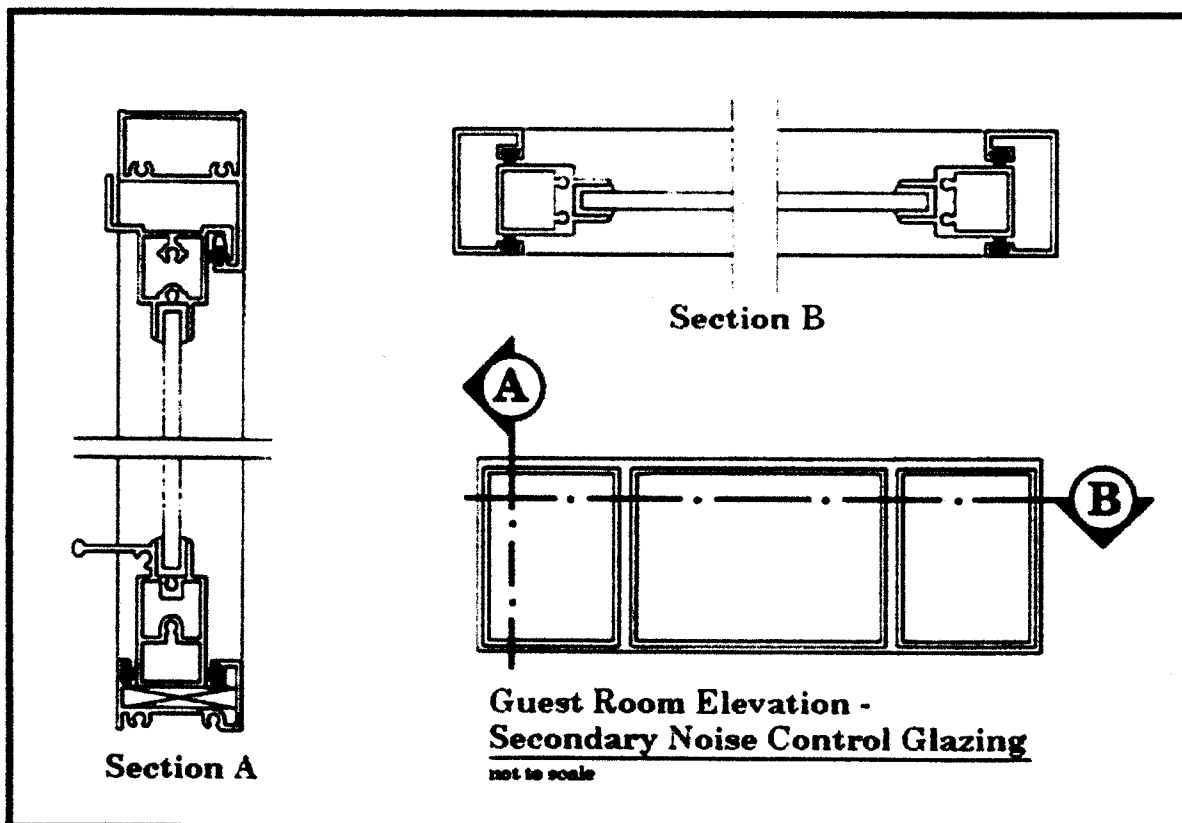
CROSS-SECTION VIEWS (LEFT AND RIGHT TOP) AND ELEVATION (RIGHT BOTTOM) OF THE RETROFIT GLAZING
